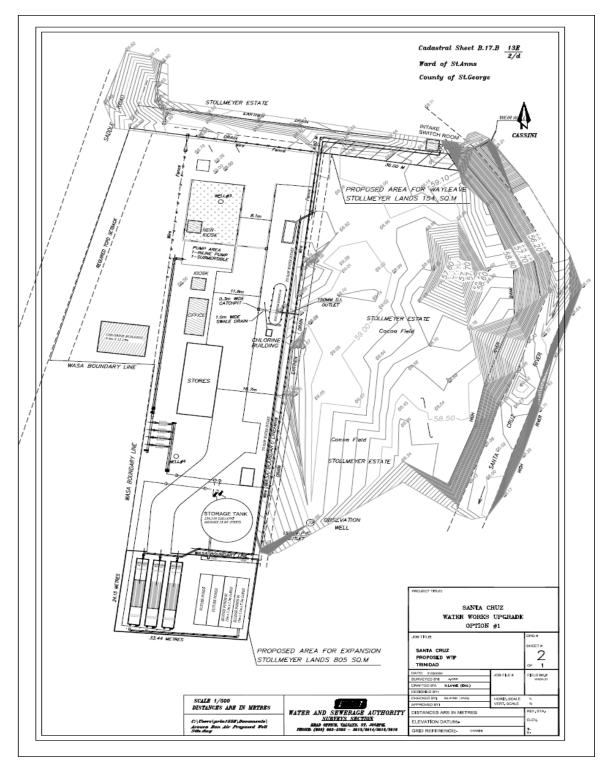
Conceptual Site Layout for the New Santa Cruz (Green Meadows) WTP
